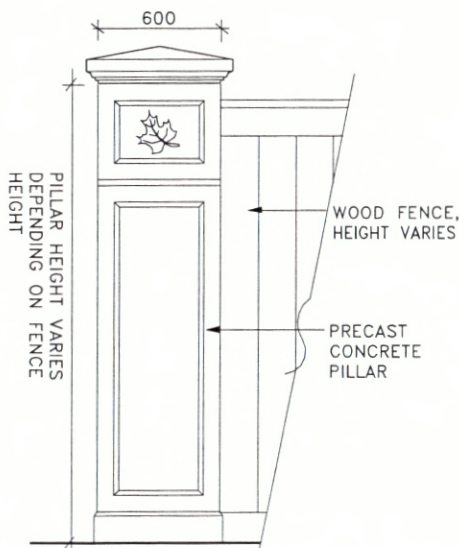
ELEVATION OF PRECAST CONCRETE PILLAR N.T.S.
